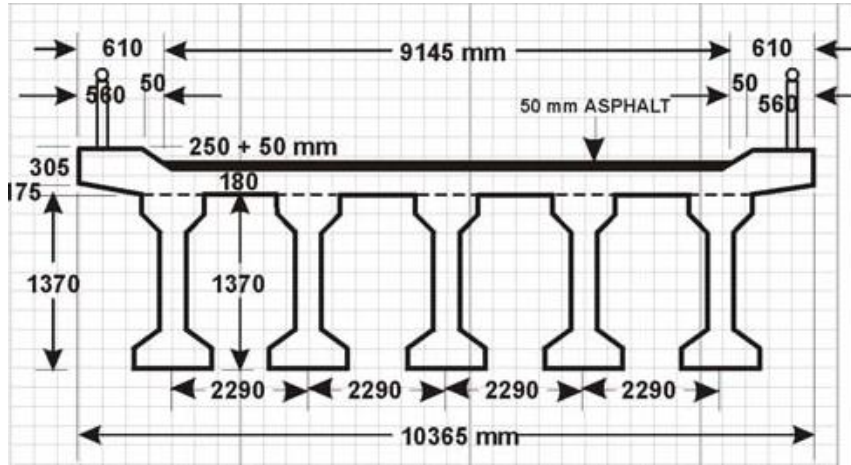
Cross section of bridge (DND, 2007a), 22.9 m CPCI girder (x5)
